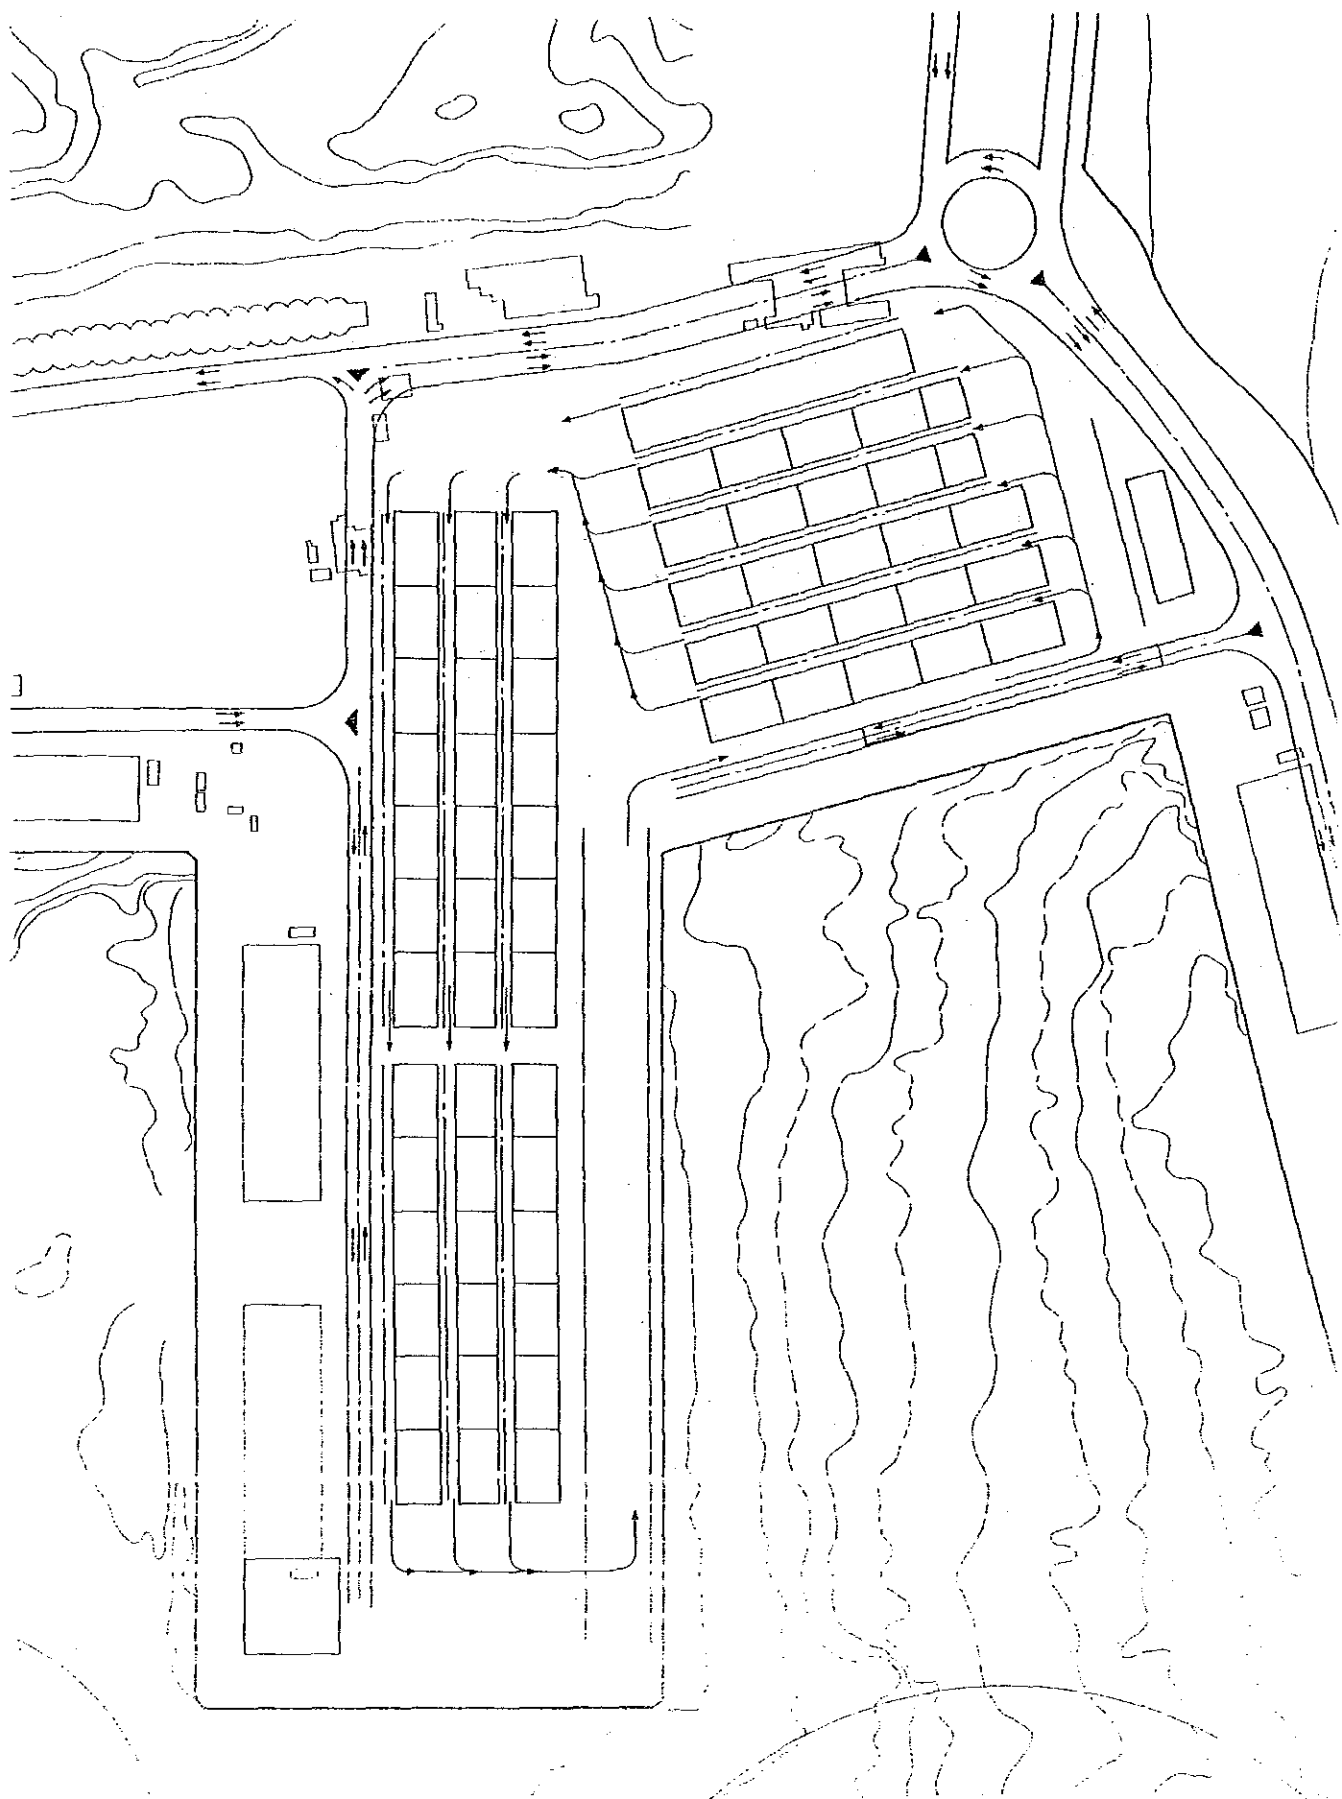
(b) Container Berth Layout Alternatives (Plan B)
